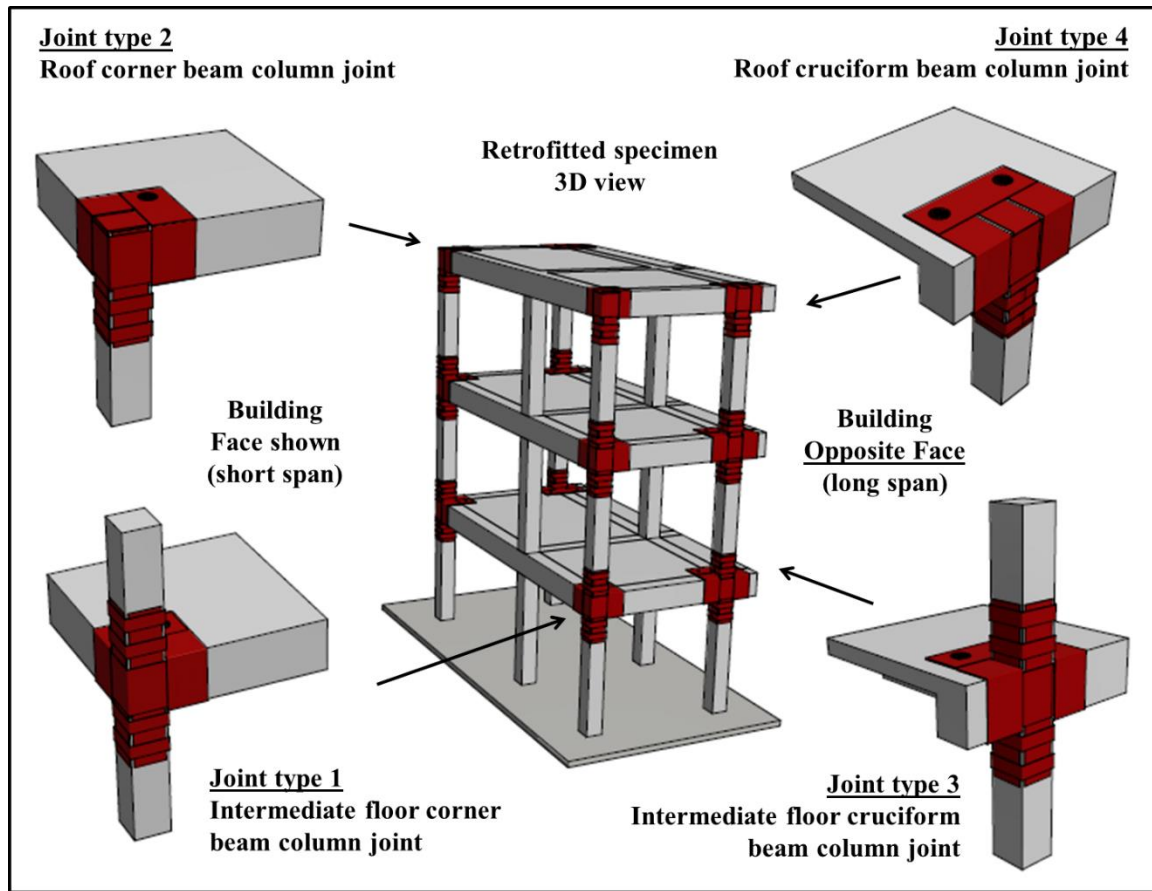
Retrofitted specimen 3D view and beam column joint type identification.
